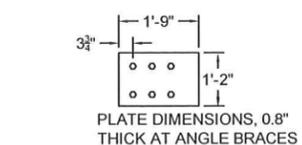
PLATE DIMENSIONS, 0.8" THICK AT ANGLE BRACES
